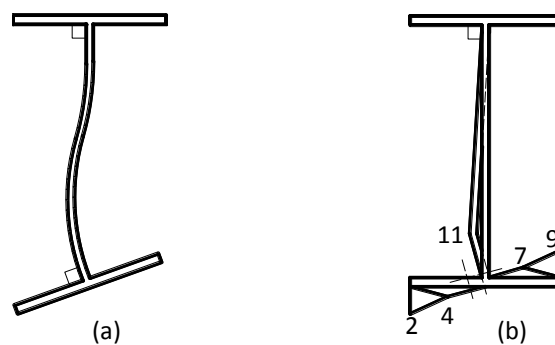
Deformation compatibility between bottom flange and beam web (a) real-beam deformation; (b) deformation in the model.
